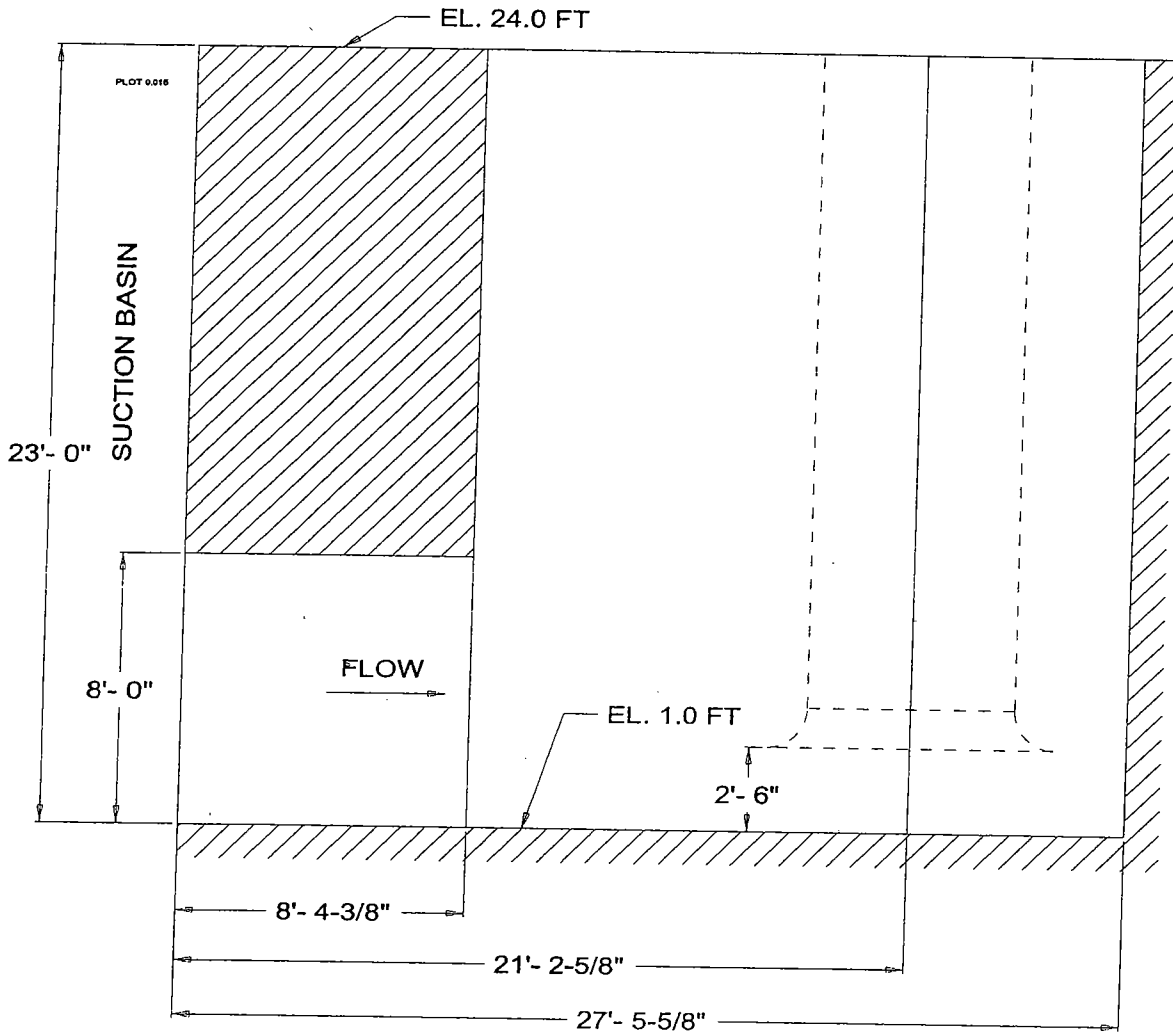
ELEVATION OF PUMP 2 INTAKE
